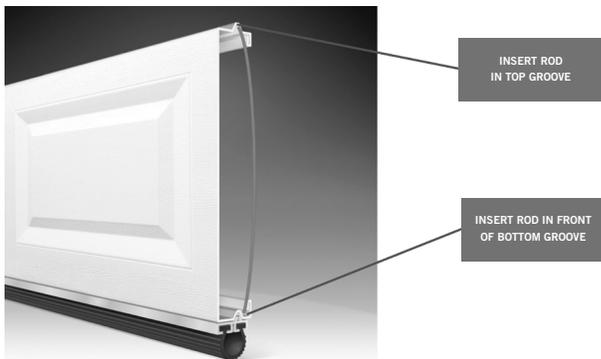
ROD IN TOP AND BOTTOM GROOVES
